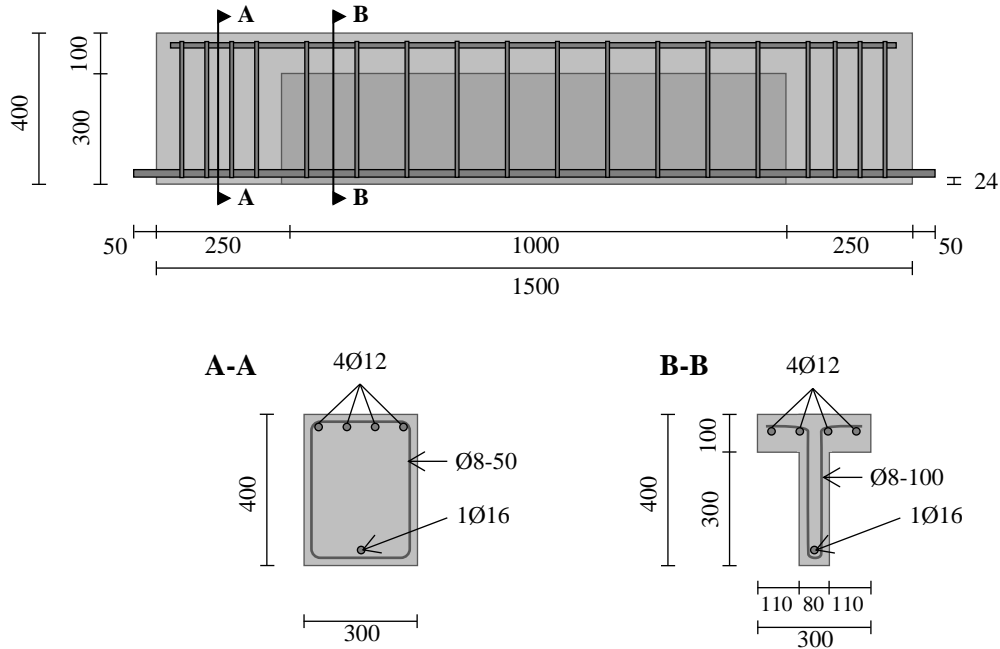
Geometric details of the tested beams (all dimensions in mm)
